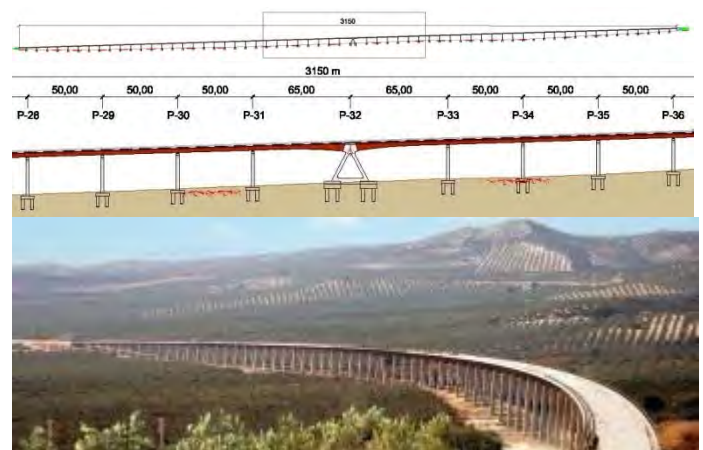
Elevation view of “Archidona” Viaduct, and picture of the Viaduct after its completion
